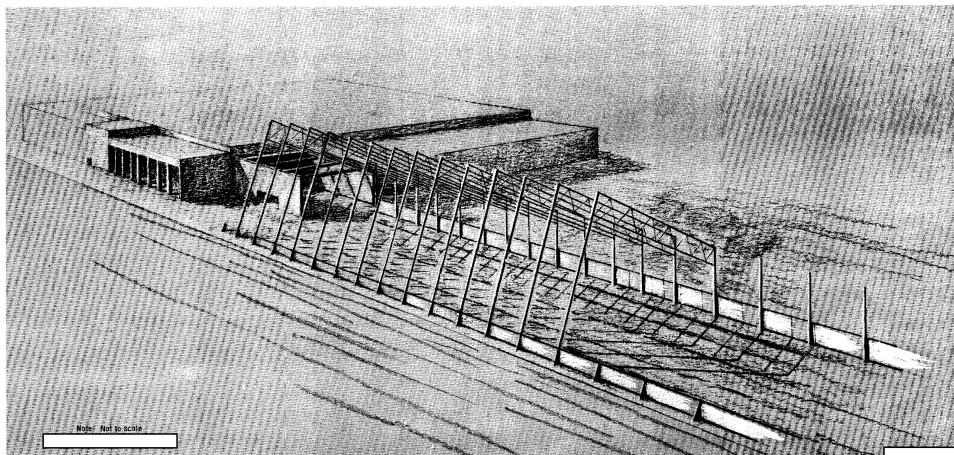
PERSPECTIVE VIEW OF LEFT ANTENNA STRUCTURE AND LEFT SUSPECT TRANSMITTER HOUSE UNDER CONSTRUCTION AT MISHELEVKA DUAL HEN HOUSE D.
